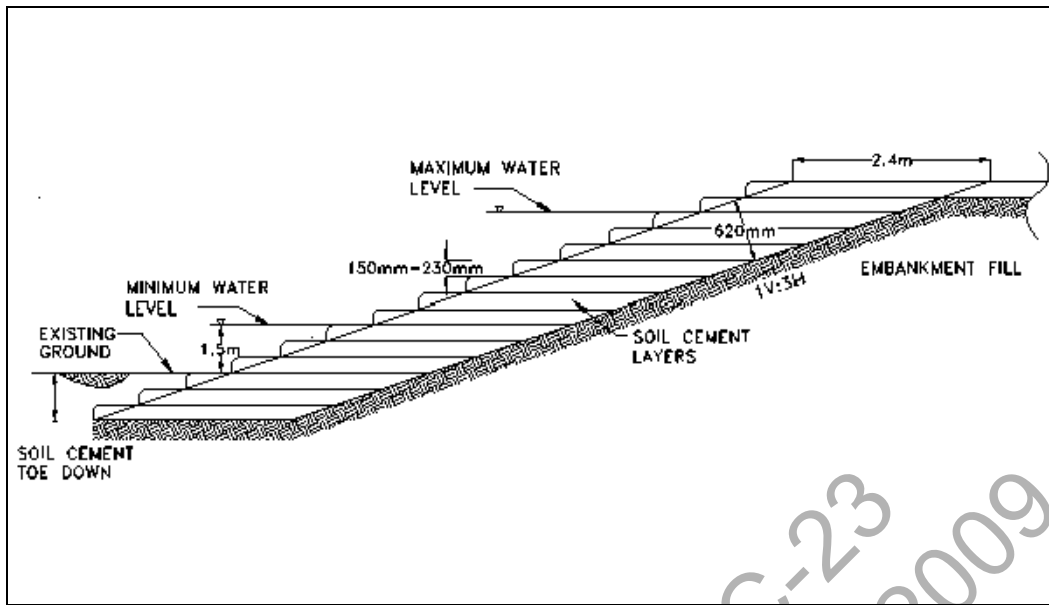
Typical section for soil cement slope protection (stair-step method).
